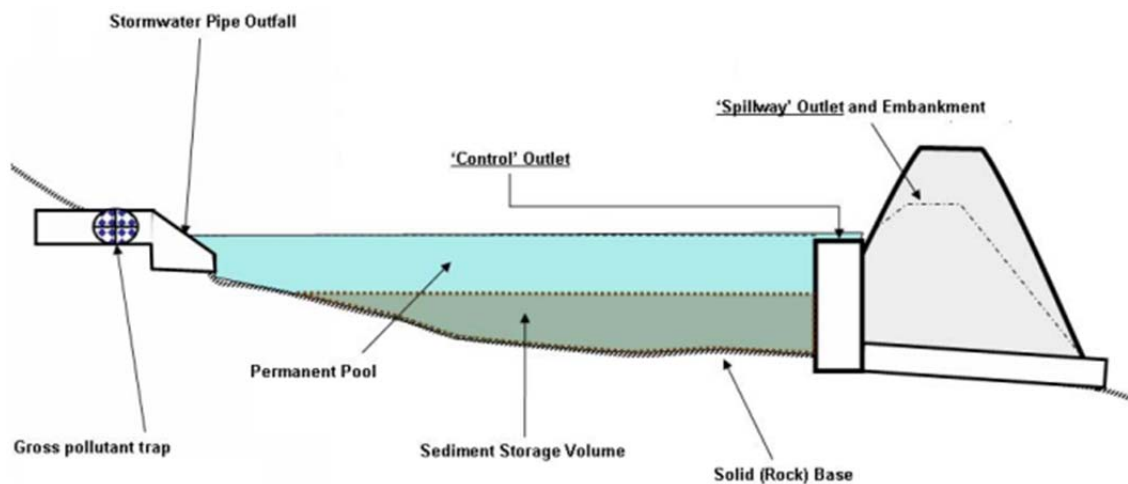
Typical Inlet Pond Schematic (Ref. 21)
